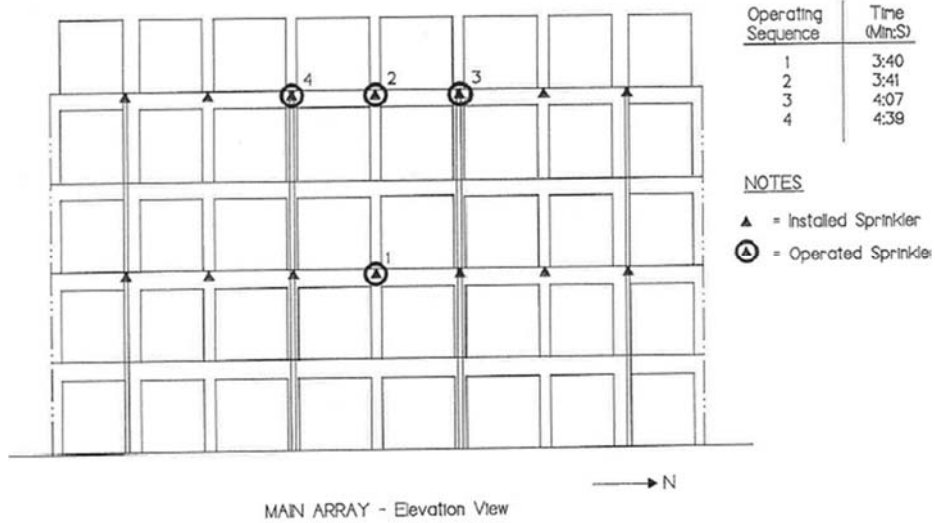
In-Rack Sprinkler Operations – Test 1
